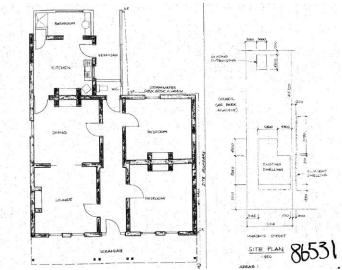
Existing conditions plan of the house and site in 1988, prior to construction of the rear extension and side carport. (City of Camberwell BP 86531/1988)
